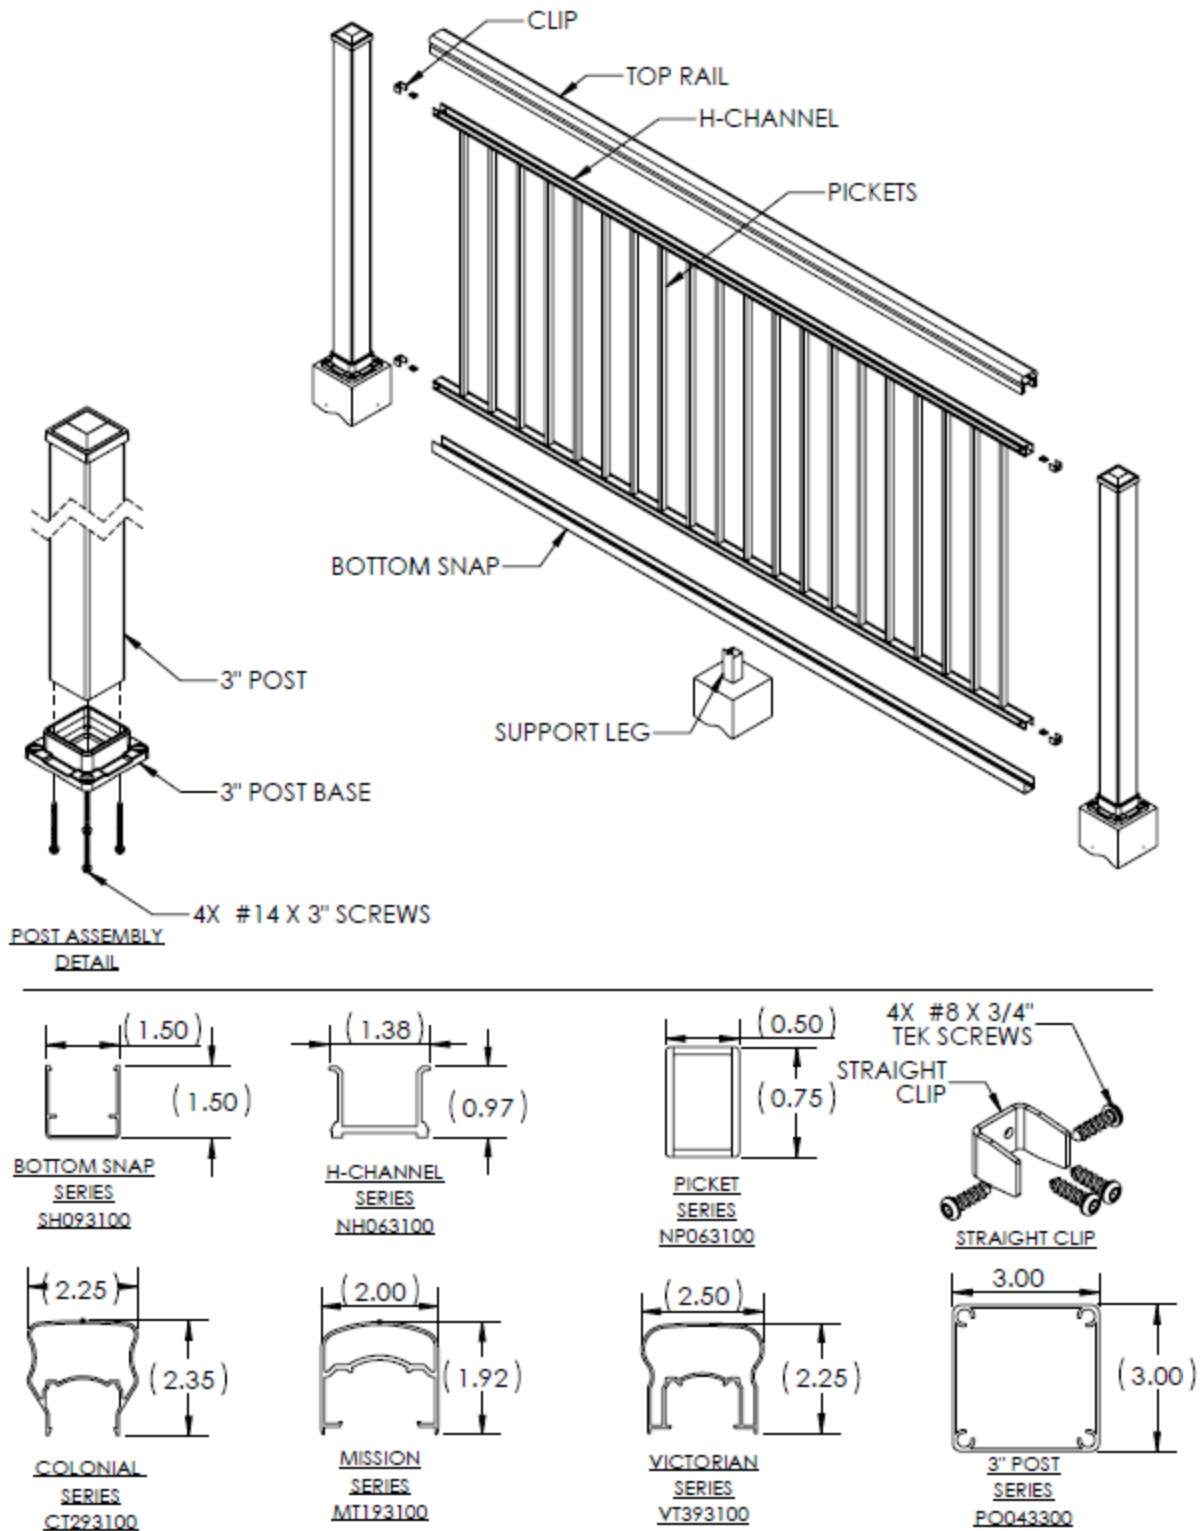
TYPICAL GUARDRAIL ASSEMBLY AND COMPONENT PROFILES
